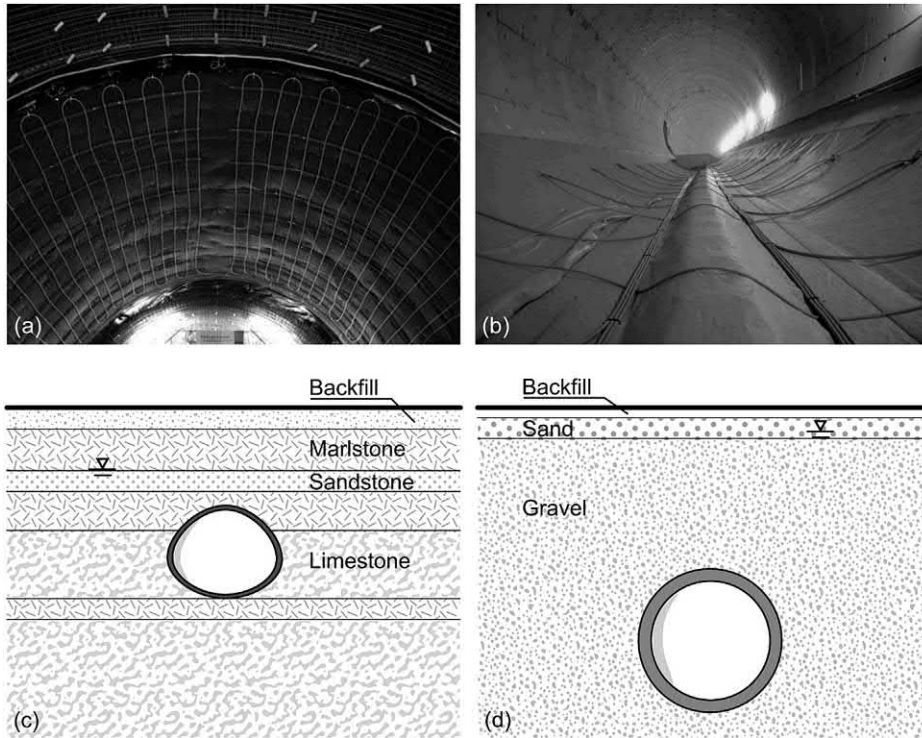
(A) The Stuttgart-Fasanenhof energy tunnel, (B) the Jenbach energy tunnel, (C) sketch of a relevant vertical cross section of the Stuttgart-Fasanenhof energy tunnel and (D) sketch of a relevant vertical cross section of the Jenbach energy tunnel. (A) Courtesy Züblin Spezialtiefbau, (B) courtesy Züblin Spezialtiefbau, (C) redrawn after Buhmann, P., Moormann, C., Westrich, B., Pralle, N., Friedemann, W., 2016. Tunnel geothermics—a German experience with renewable energy concepts in tunnel projects. *Geomech. Energy Environ.* 8, 1–7 and (D) personal communication of Dr Sebastian Homuth, Züblin Spezialtiefbau GmbH.
